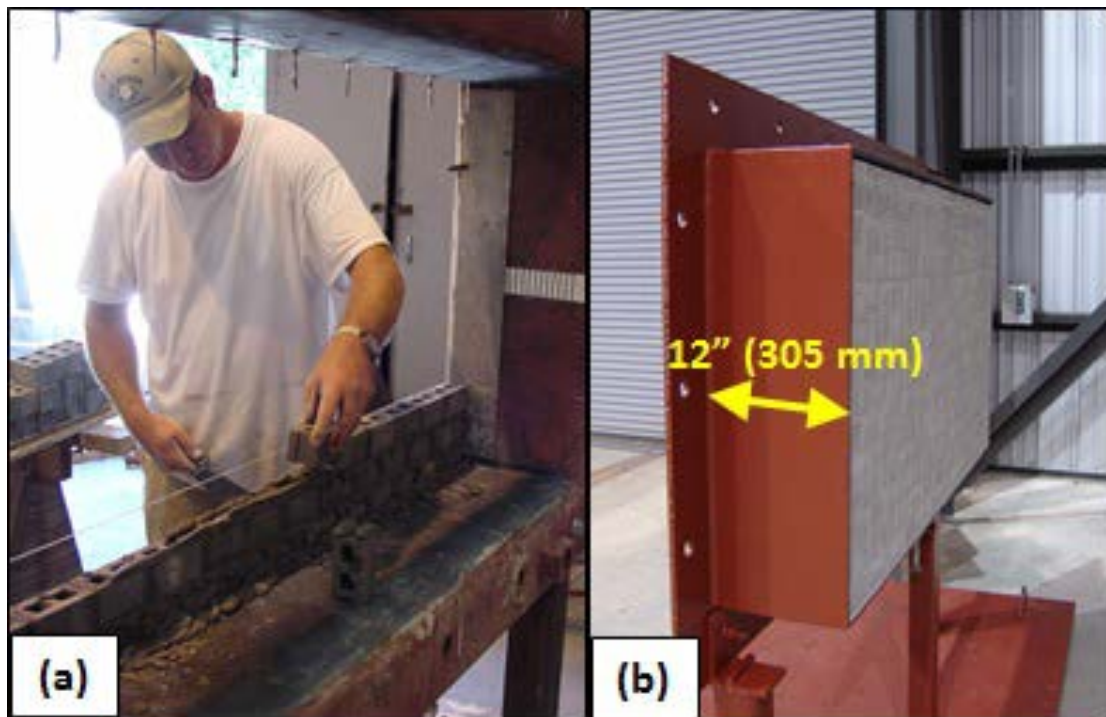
Subscale construction. (a) Mason placing CMU blocks. (b) CMU wall flush with edge of frame.
